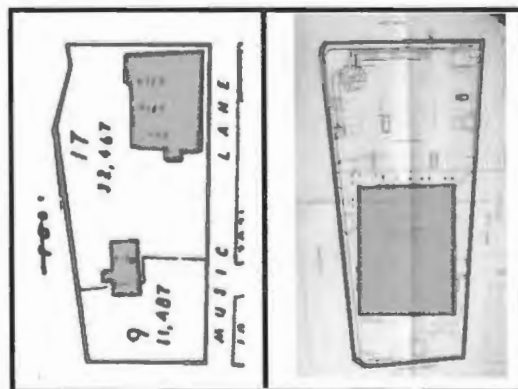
Former site layout of 3336 Post Road and New site plan. Warwick, RI. Courtesy of Warwick Planning Department.
